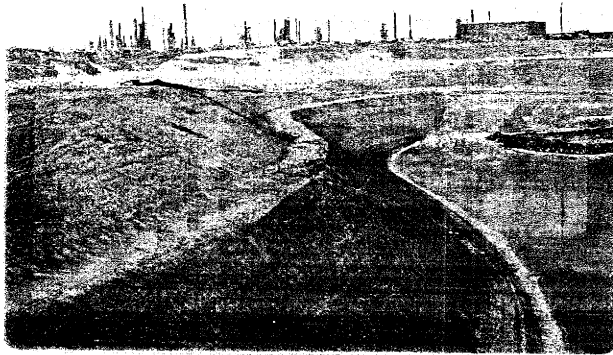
Initial Cracking in the North Abutment of FORS-2
